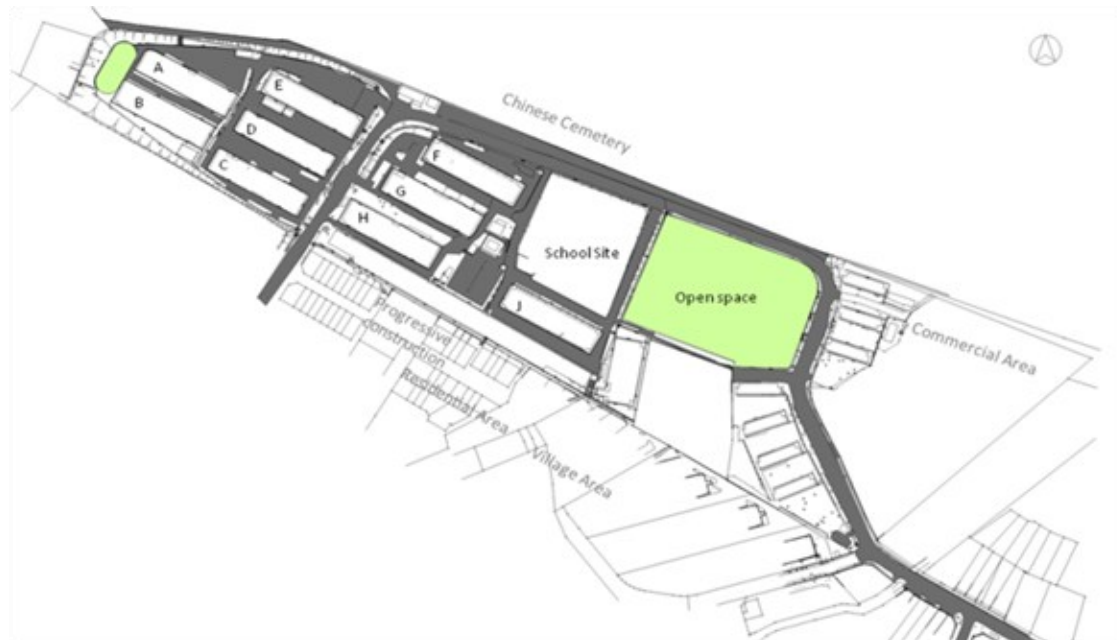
Layout Plan of the Rifle Range Flats, Penang, 2011
